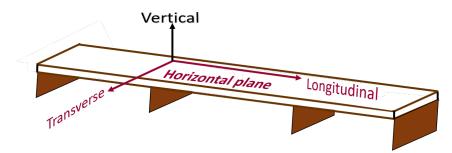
Vertical and horizontal (longitudinal and transverse) direction visualized on a bridge deck.
